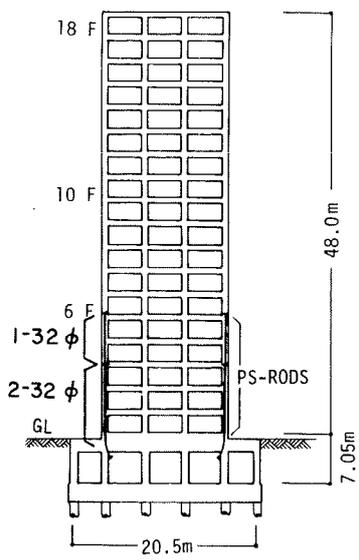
APPLICATION OF COLUMN PRESTRESSING
